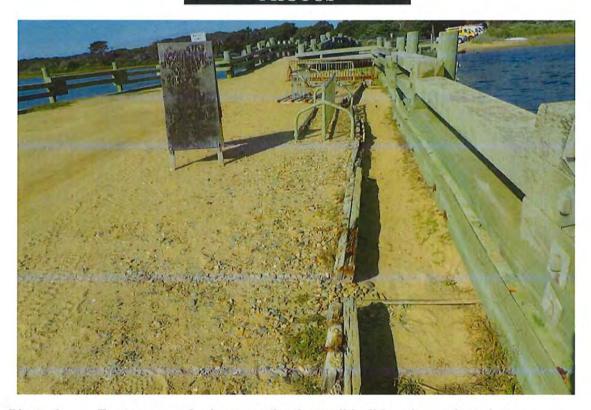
East approach along north wingwall bulkhead, erosion along abandoned bulkhead exposing tiebacks.
